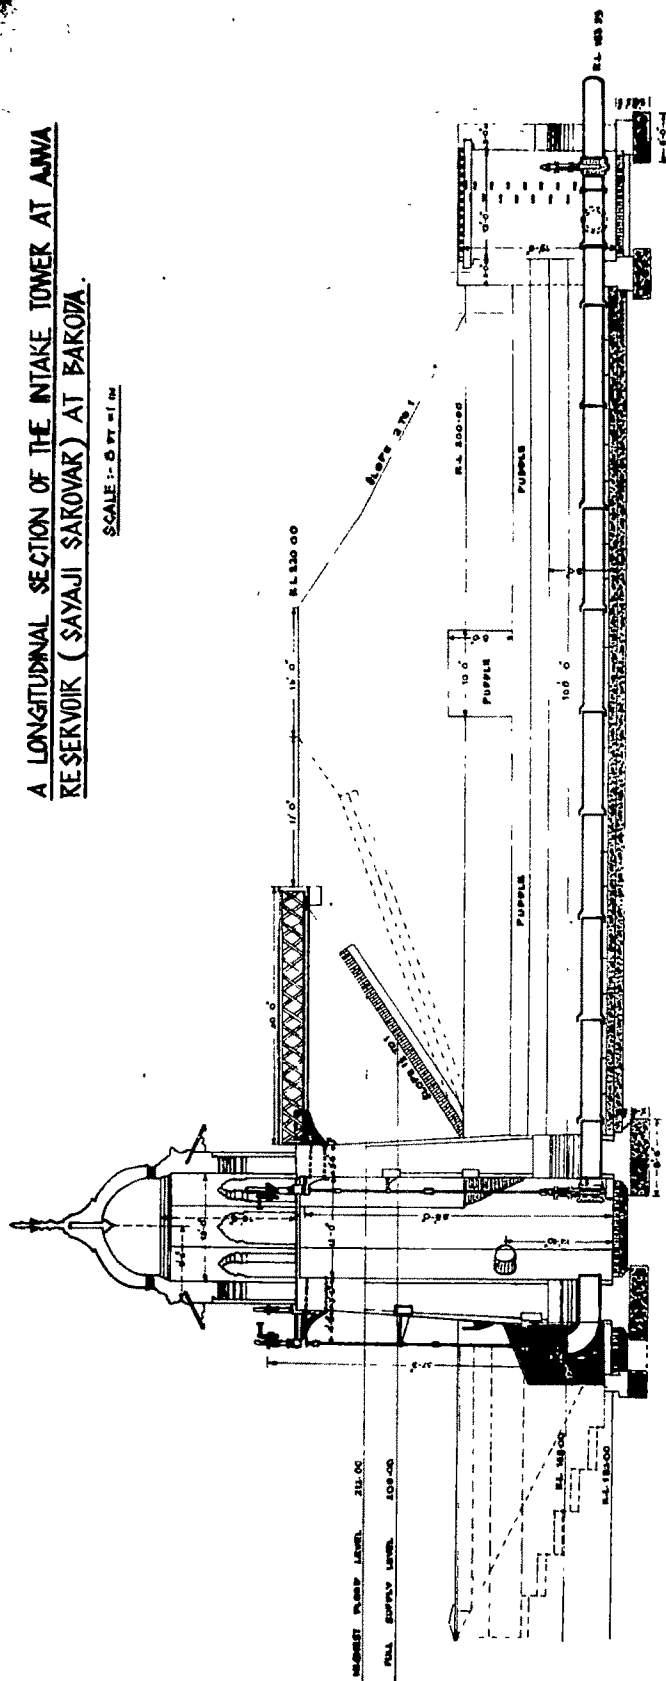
A longitudinal Section of the Intake Tower at the Ajwa reservoir.
